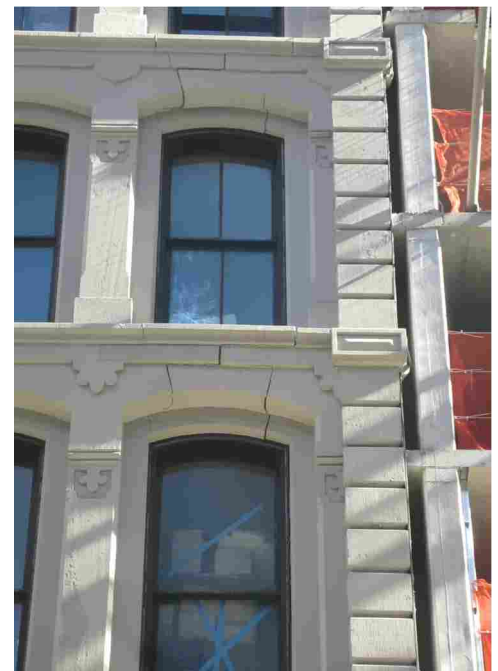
Cracking and displacement of existing stone arches due to foundation settlement associated with adjacent construction. New floor slabs also extend into a required seismic gap, where they can apply damaging earthquake loads to the existing building.
